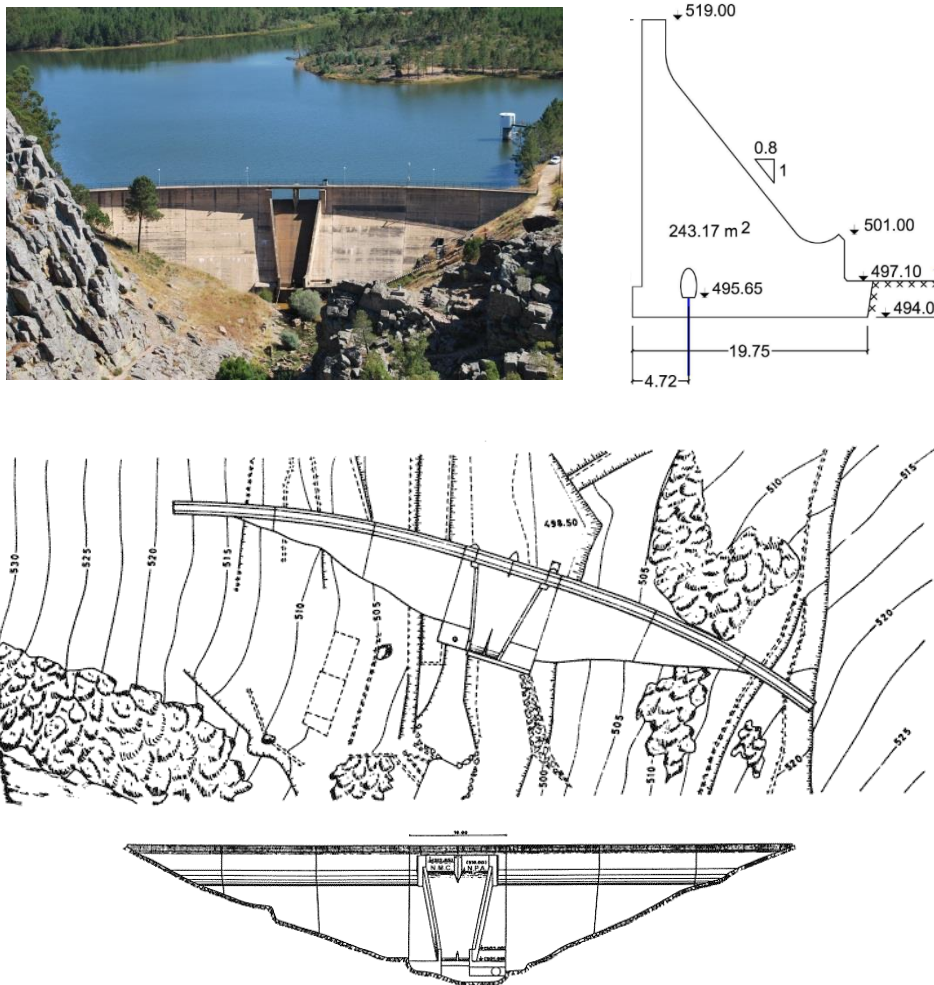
Gravity dam. On the top left, downstream view (photo). On the top right, the cross section view (Pereira, R.; 2011). On the middle, the site plan. On the bottom, the downstream elevation view (CNPGB, 1992)
